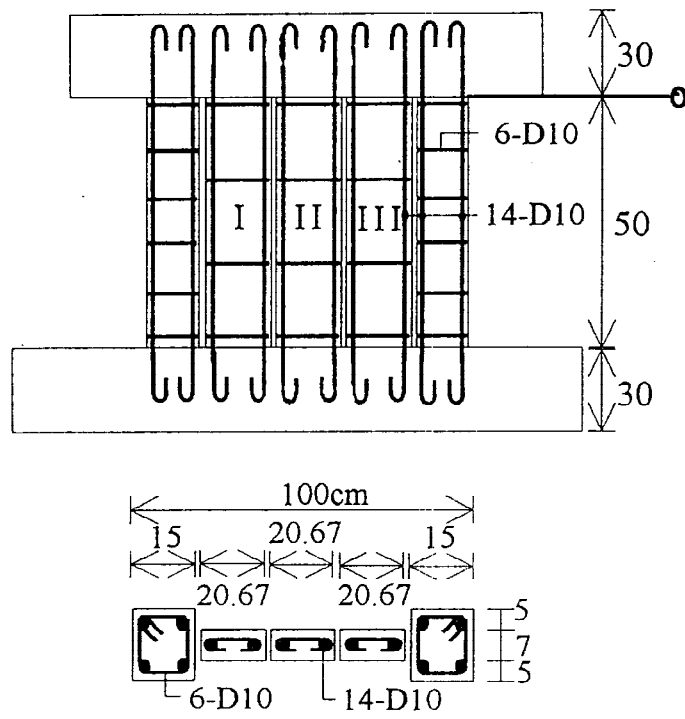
Dimension and Reinforcement of Group 2 Specimens
